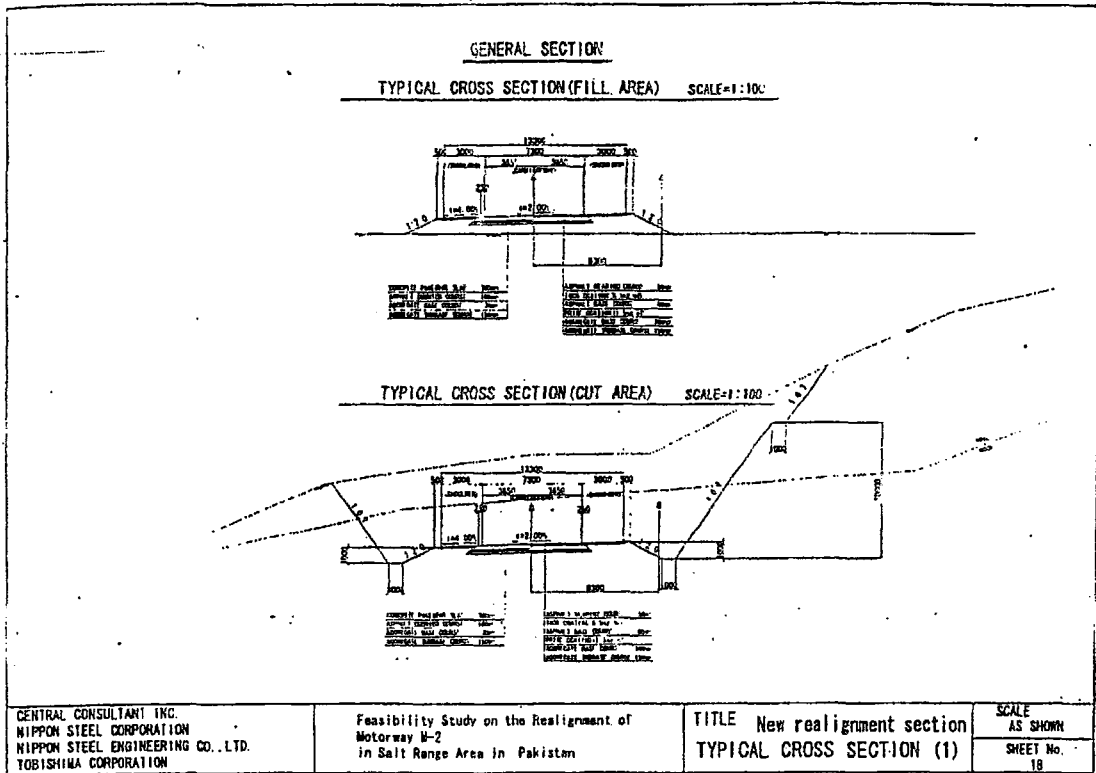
Typical Cross-Sectional Configuration of New Realignment Route (1)
